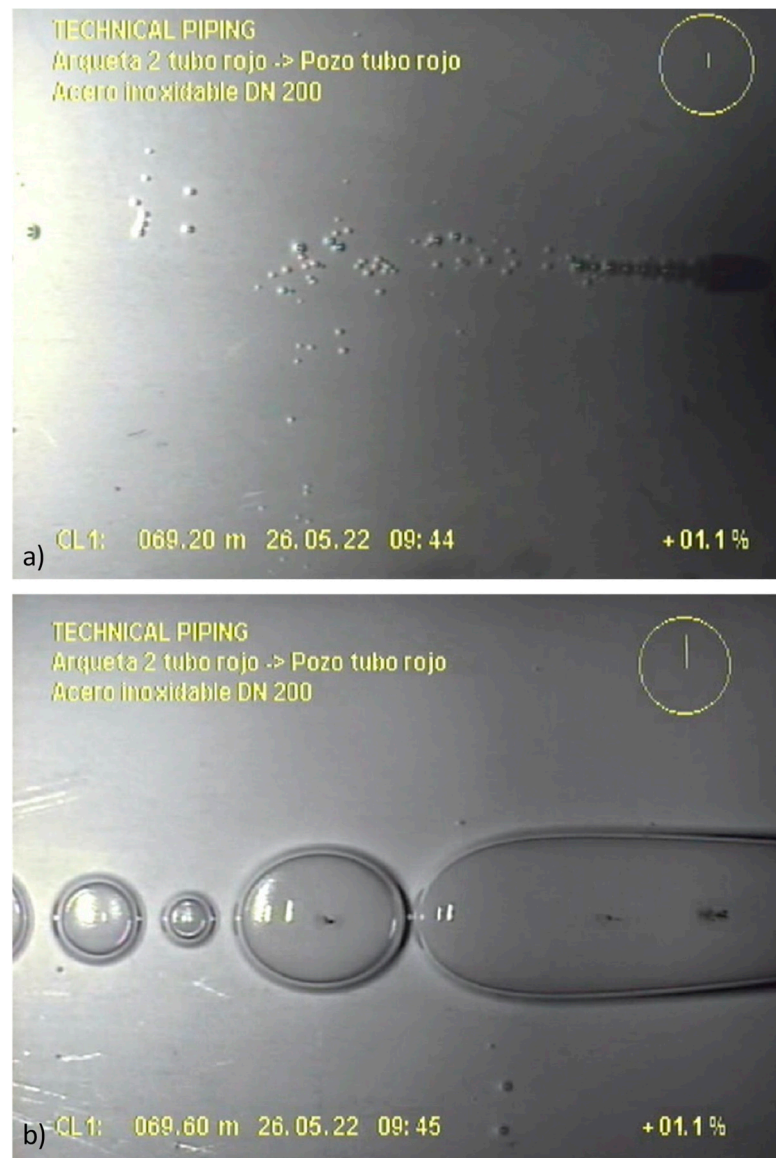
Video-inspection image of the interior of the piping system. (a) Gas bubbles; (b) detail of gas bubbles, right over some pitting defects.
